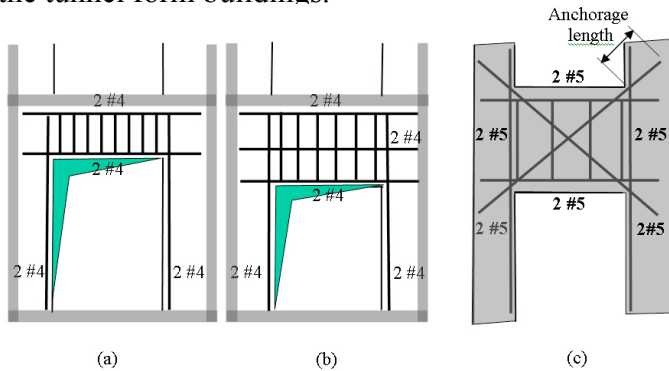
Reinforcement detailing around the openings of pierced shearwalls
